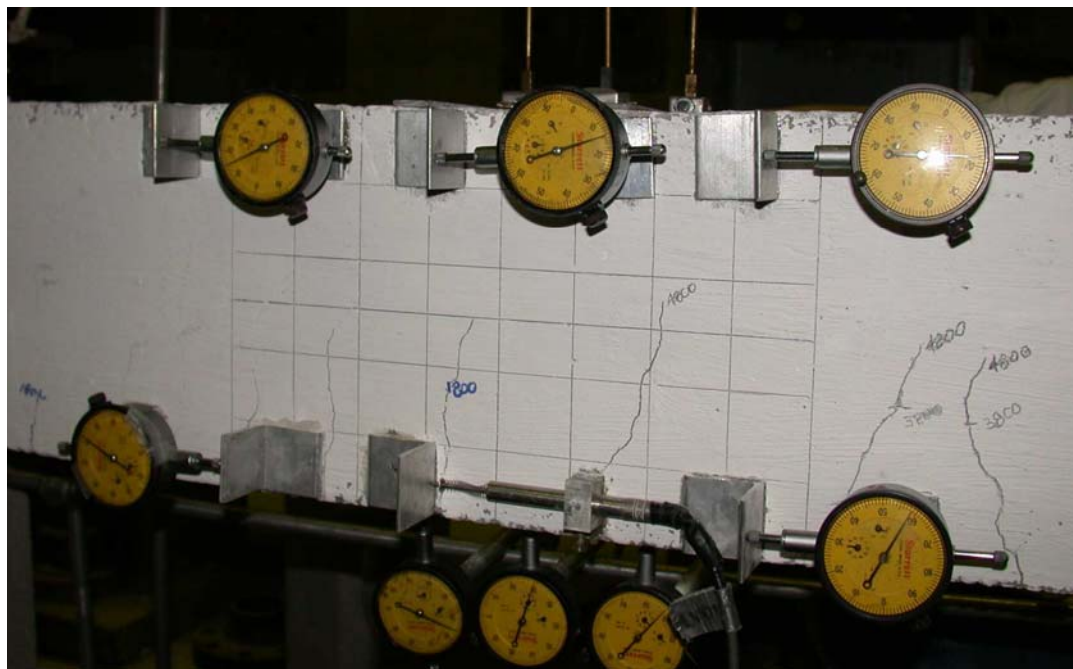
Beam P-1 Cracking at Approximately 4000 lb.
